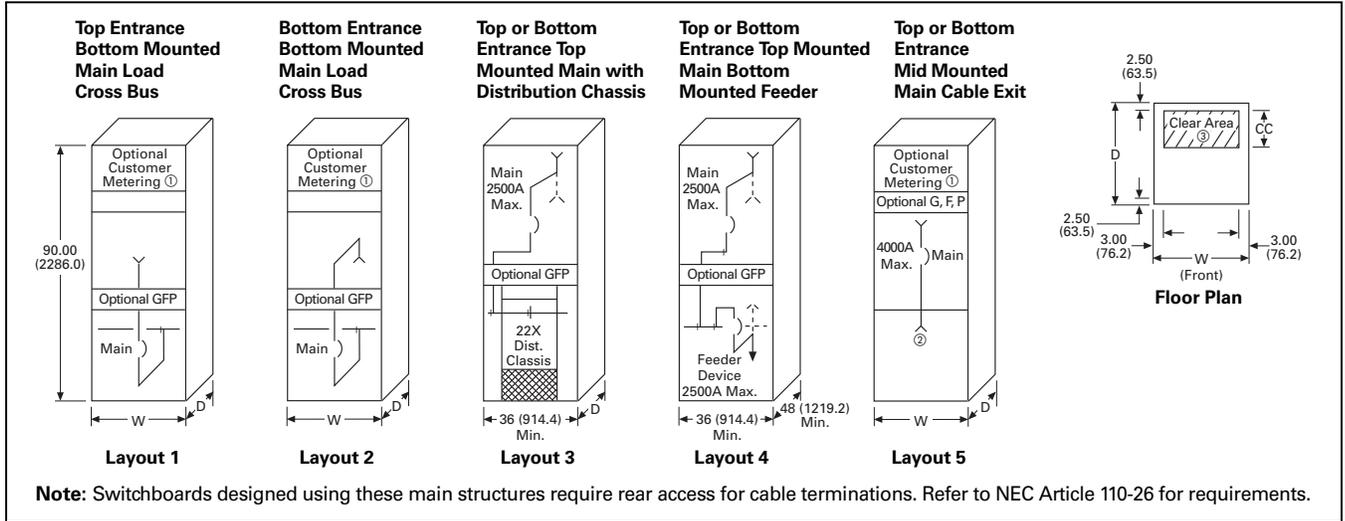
Main Section Layouts—Dimensions in Inches (mm)
